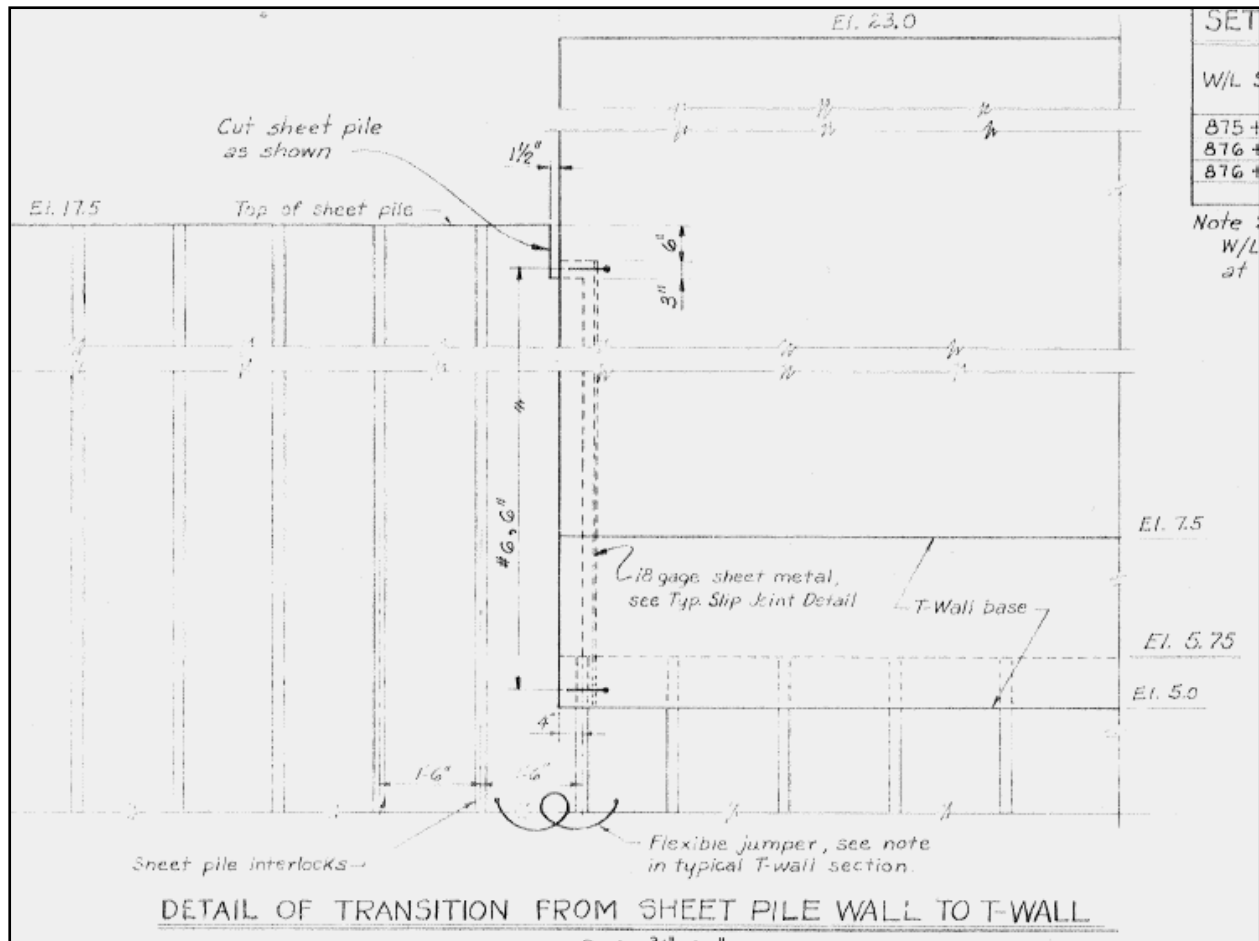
Pump Station 15 Top Elevation Difference of 5.5' Between Sheet Pile and T-Wall (plate 14 of 16 from Contract DACW29-77-C-0037, Mod P00001). If pre-Katrina sheetpile elevation was 17.5 ft and storm surge in the MRGO/GIWW was up to 18 ft, then there was minimal overtopping, and the sheetpile breach may have had contributing factors other than overtopping scour
